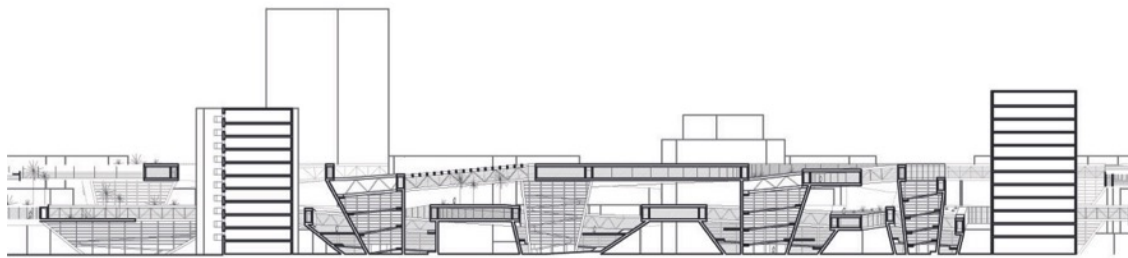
Longitudinal Section (Source: Mansour, 2009).
